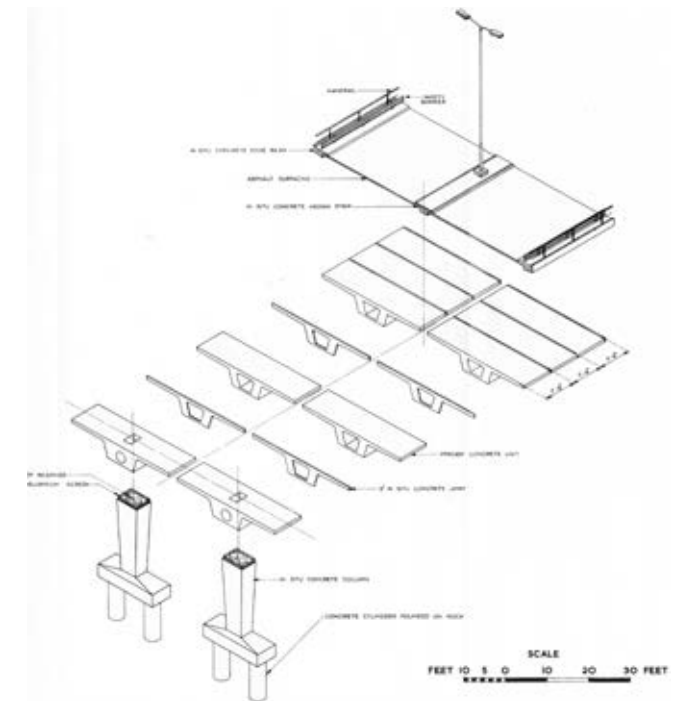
EXPLODED VIEW OF SUPERSTRUCTURE
